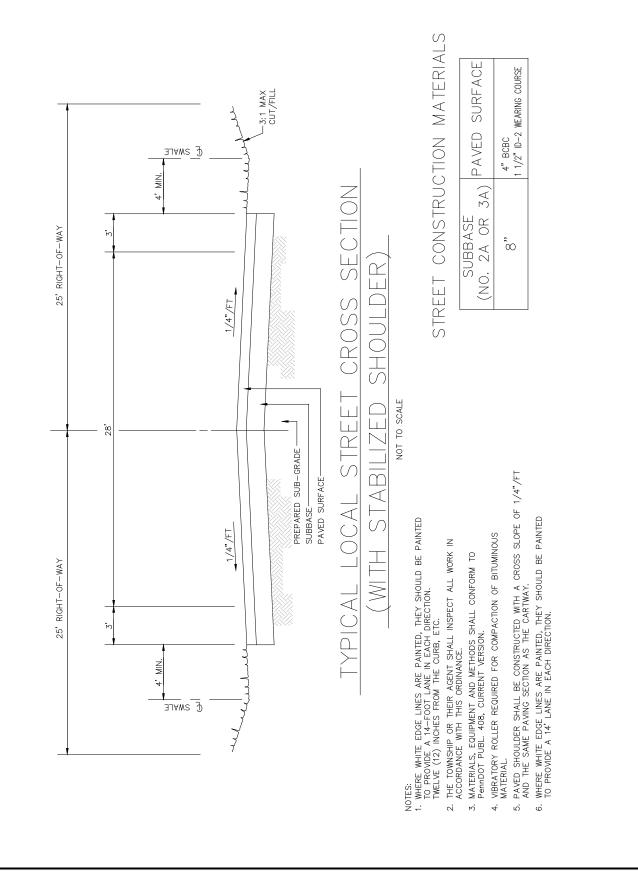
Typical Local Street Cross Section (with Stabilized Shoulder)
